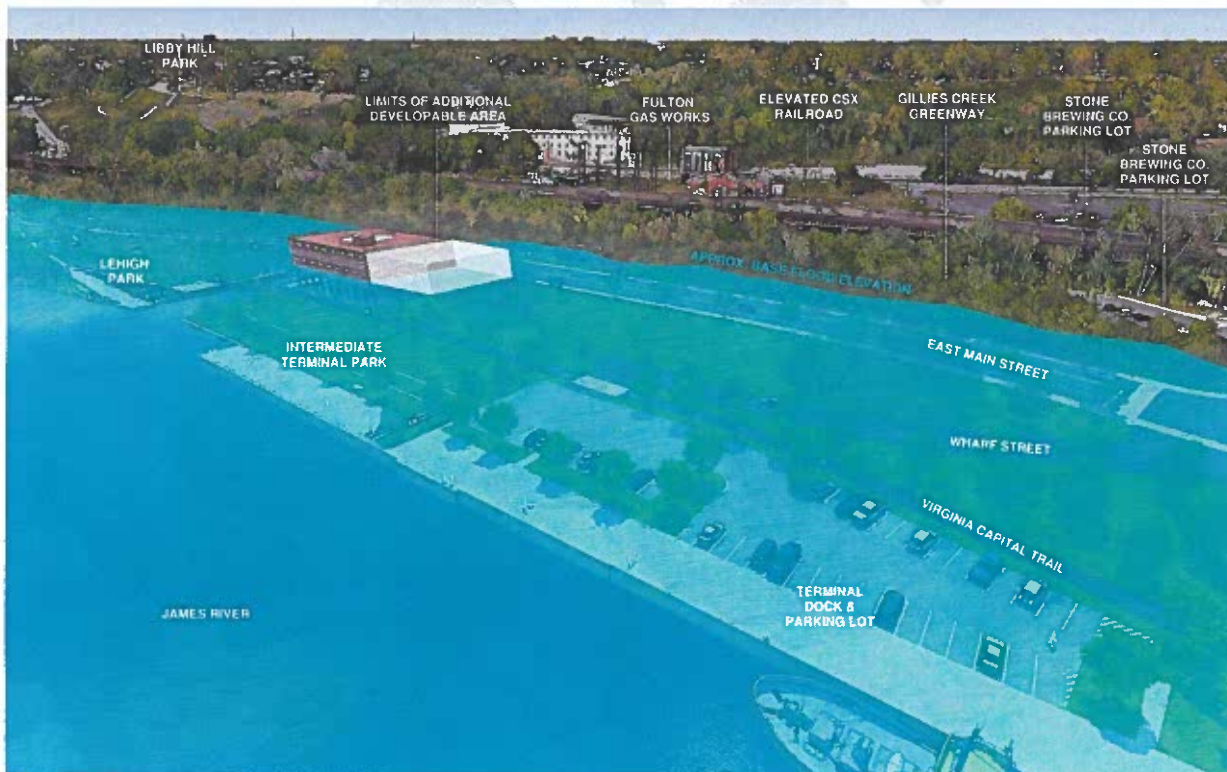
Model showing limits of developable building envelope with Base Flood Elevation overlay
